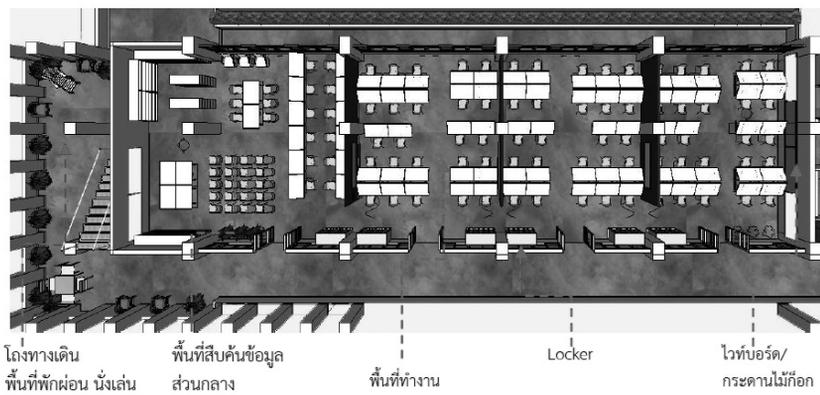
Furniture lay out AR-412-1/AR-412-2 (Floor 4) studio type.3
